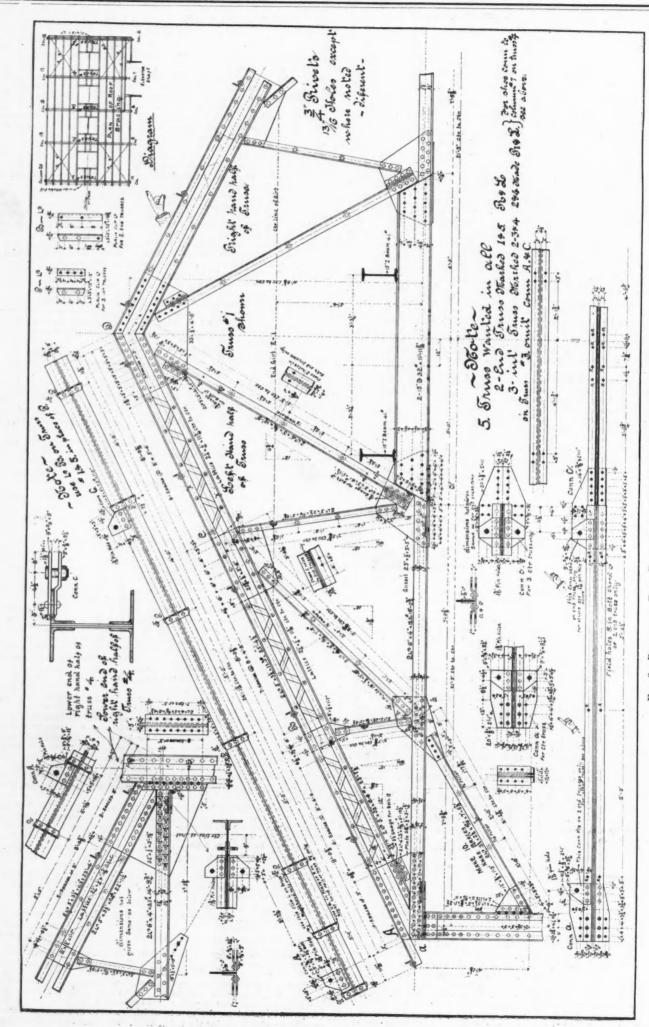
Details of Roof Trusses for Ohio Steel Company Building.
